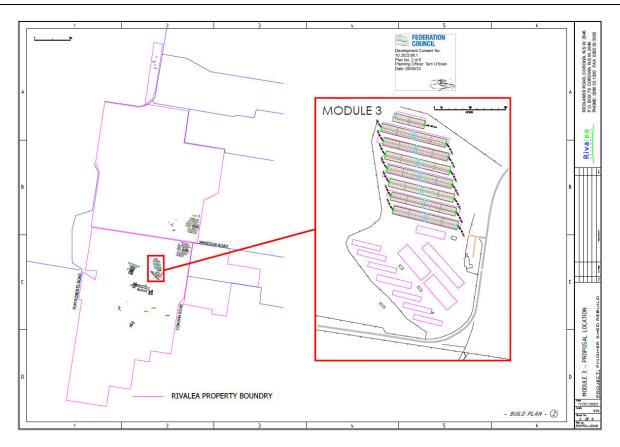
Approved Site Plan - DA2023/86. (Rivalea, 2024)
